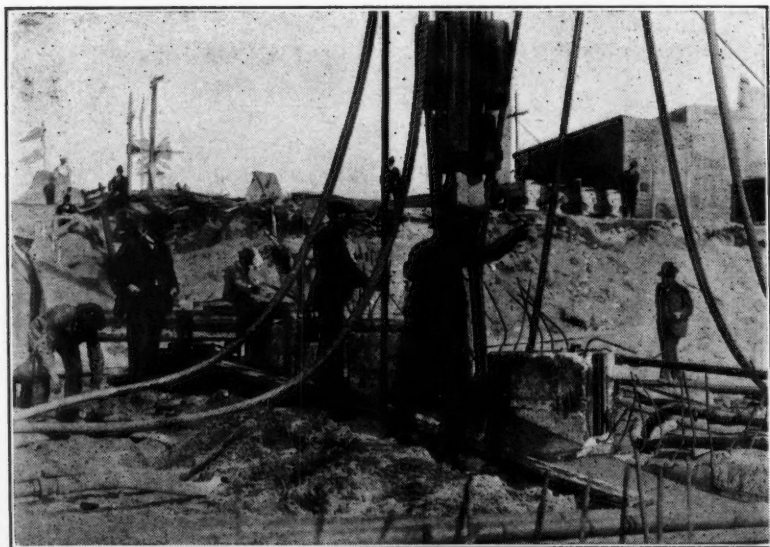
JETTING DOWN PILES, OCEAN BEACH ESPLANADE, MAY 5, 1916.
